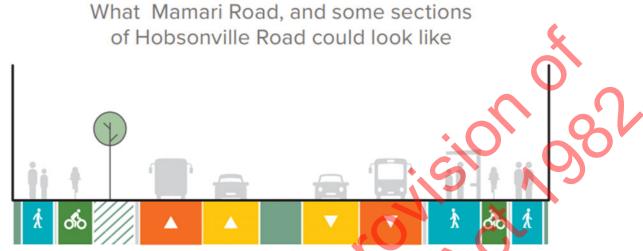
Potential Mamari Road Layout (Source: Supporting Growth Programm)
